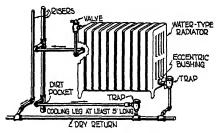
Top and Bottom Opposite End Radiator Connections with Heel of Down-Feed Riser Dripped into Dry Return
